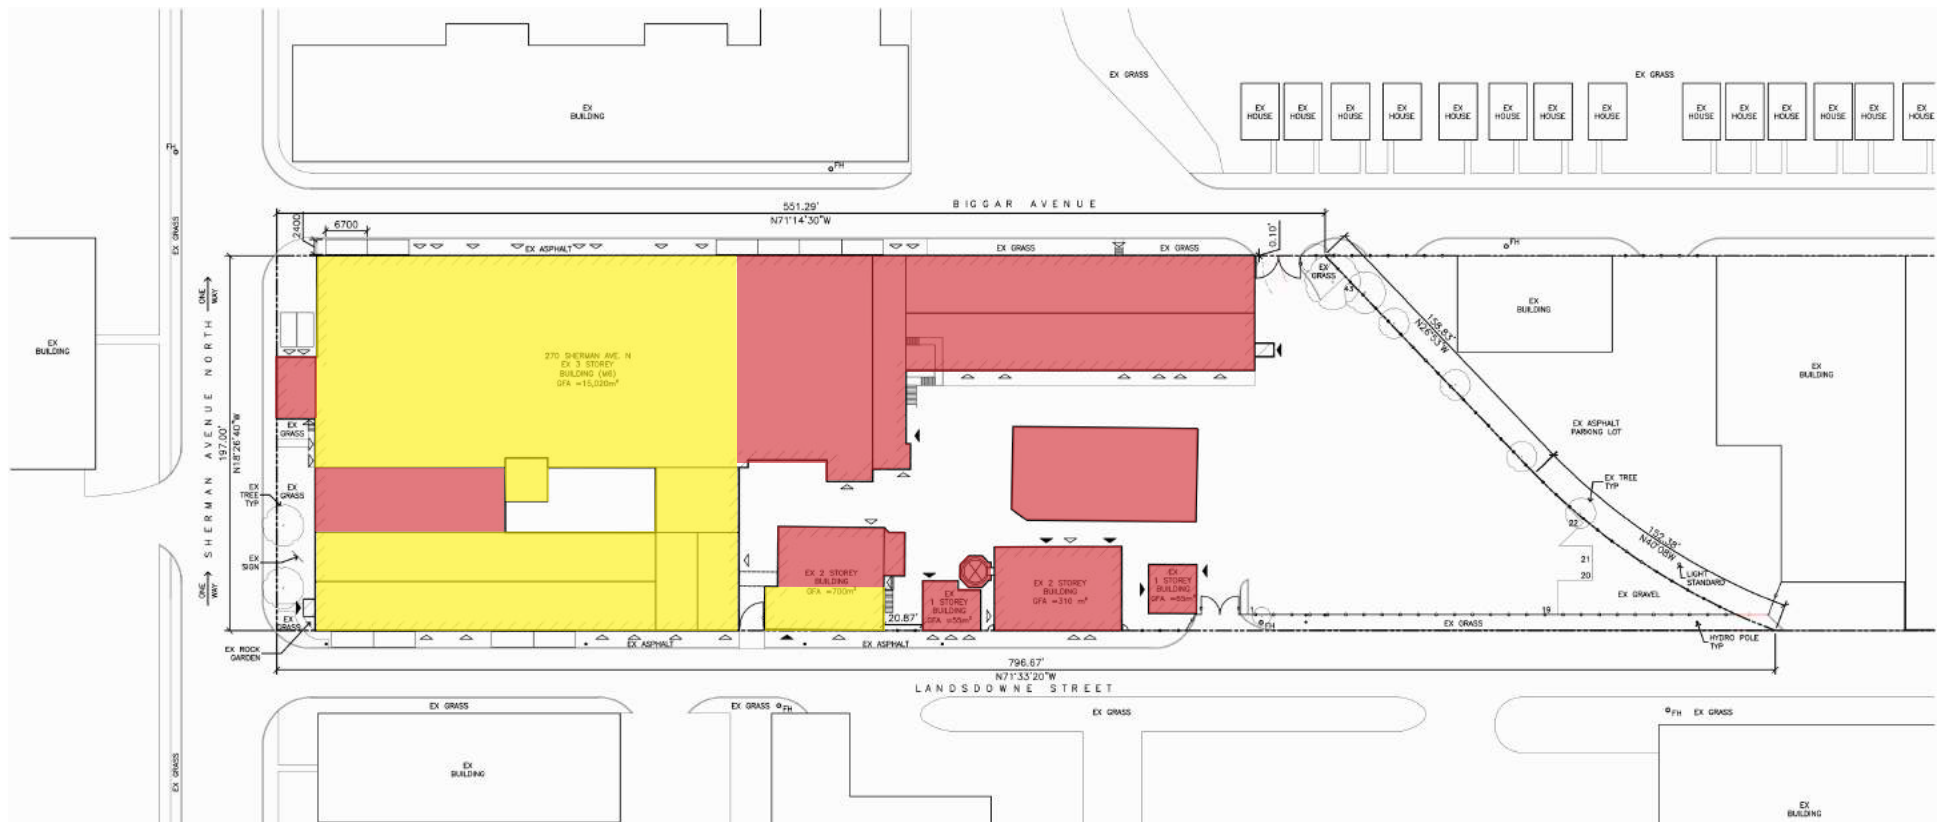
Site Plan (NTS) by mcCallumSather
